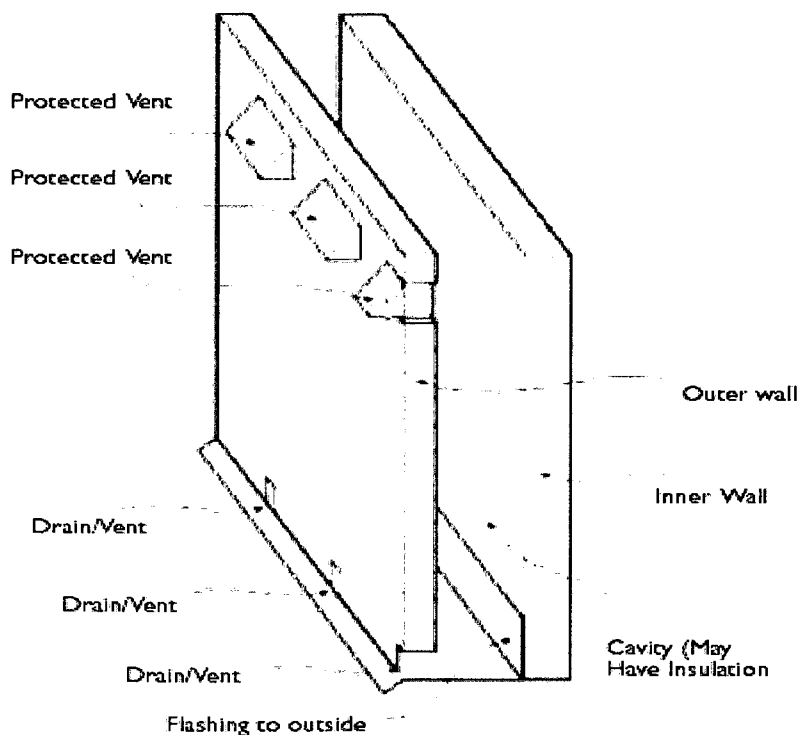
Back ventilated cavity wall in Europe (from Kerr, A. 2001).
